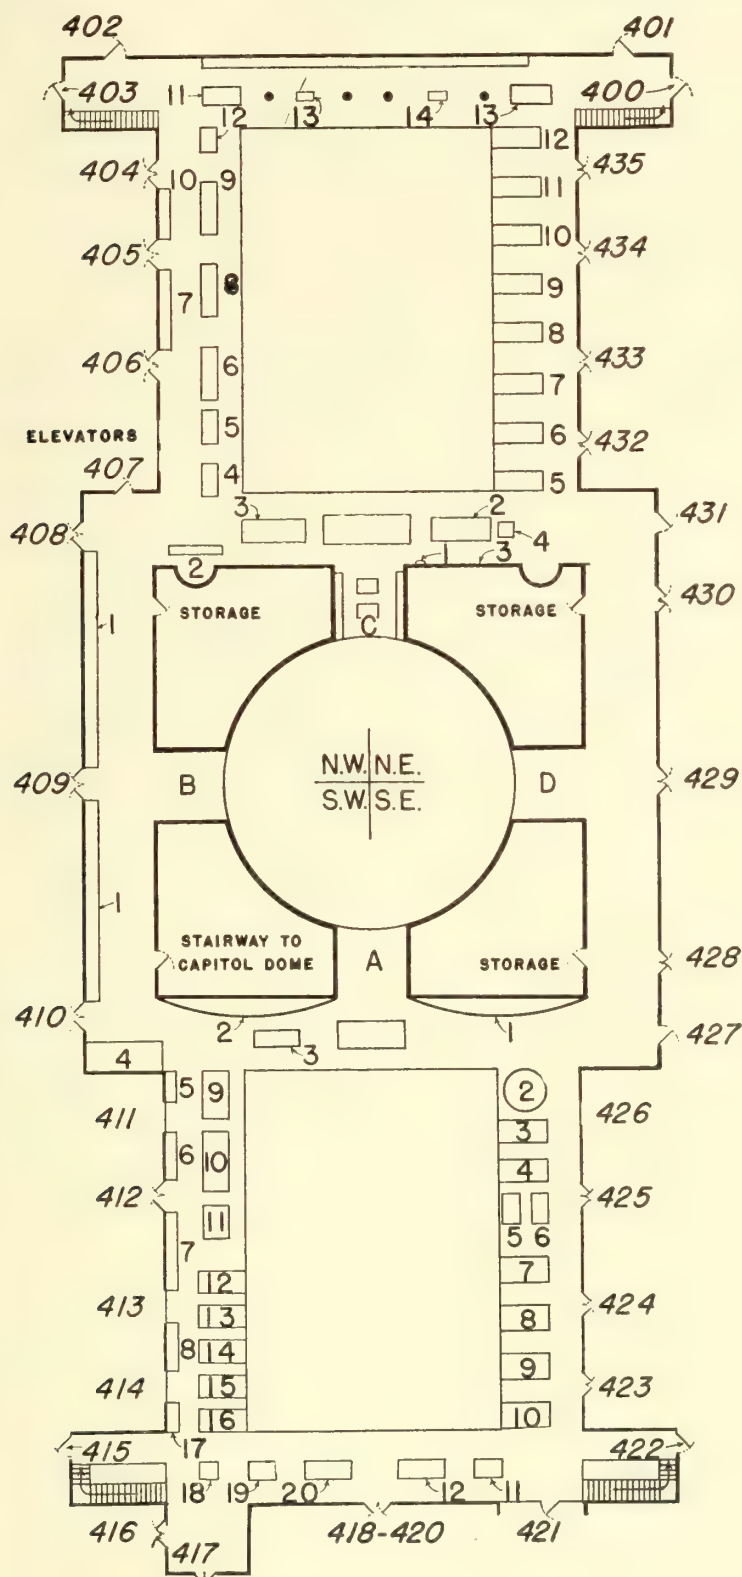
FLOOR PLAN OF STATE MUSEUM
